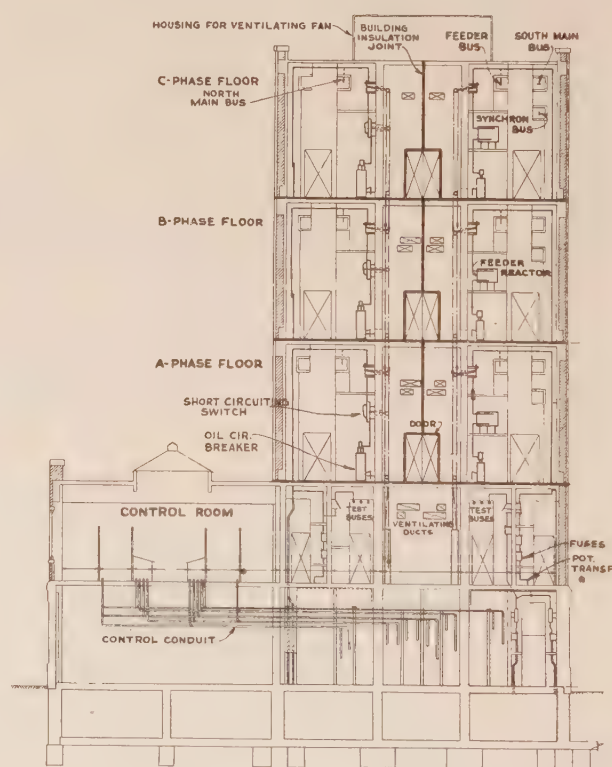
SIDE VIEW OF SWITCH HOUSE APPARATUS
